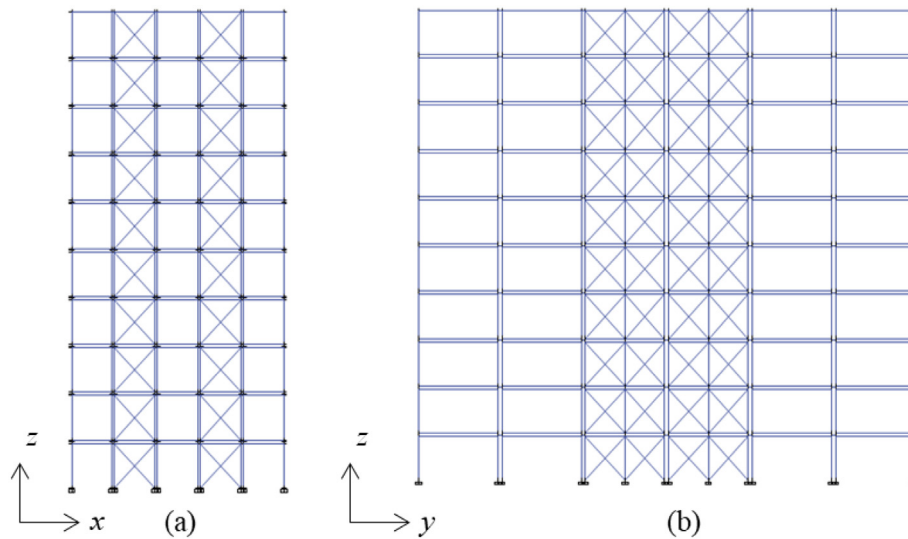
Elevation view of 10-storey residential modular building with central braced modules (a) A - A and (b) B - B (all units in m).
